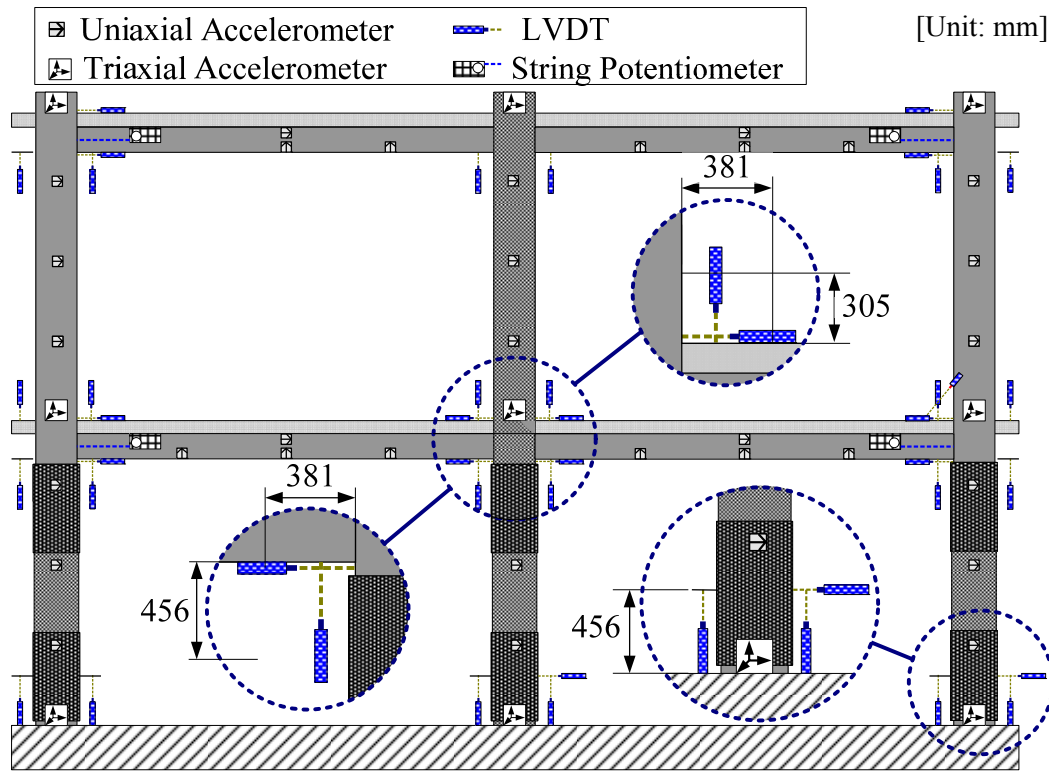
Schematic view of LVDTs, string potentiometers, and accelerometers
